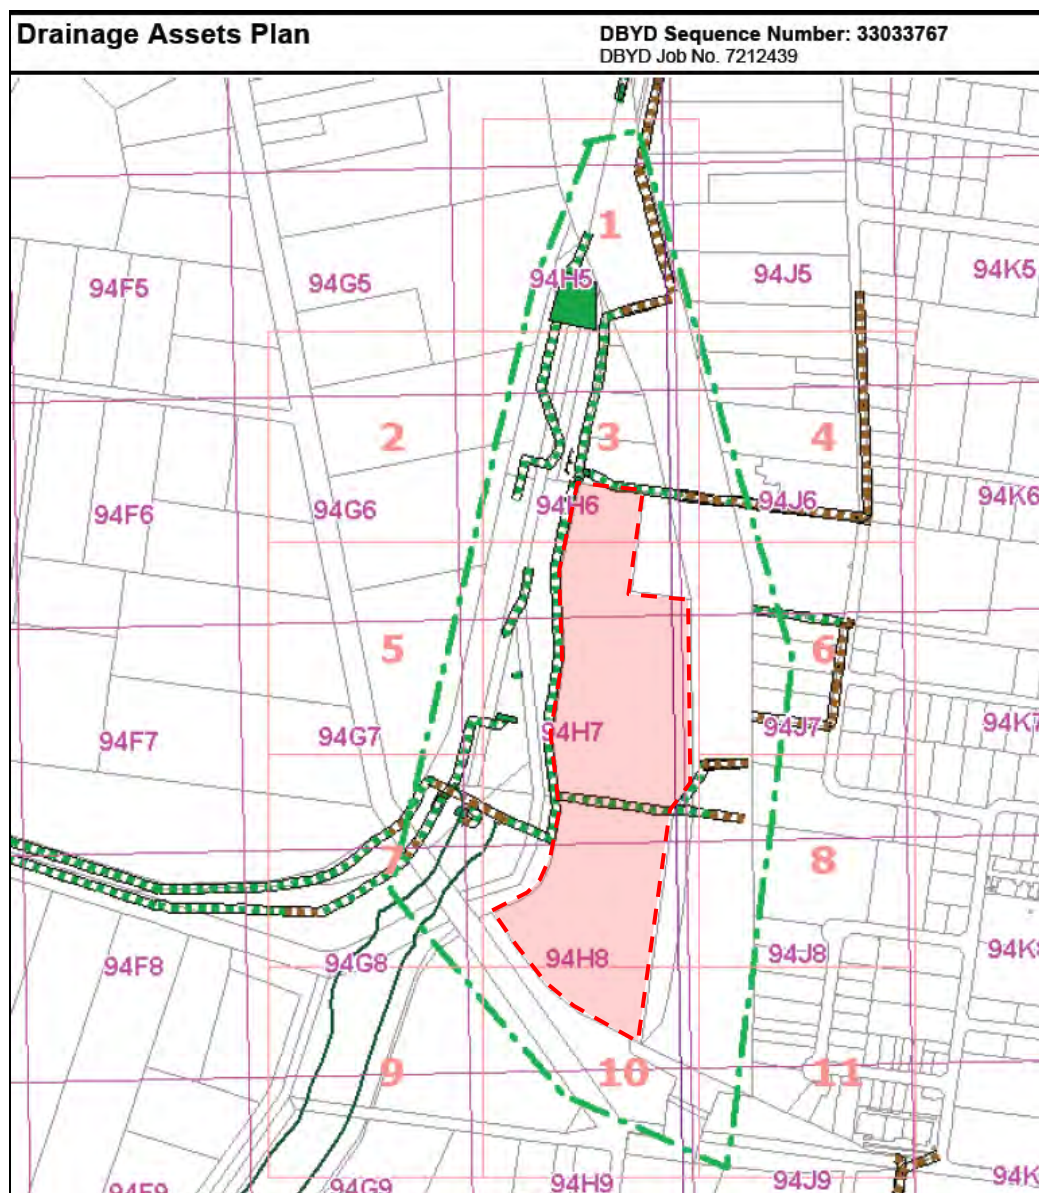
Melbourne Water Drainage Assets Plan, DBYD Info 13 March 2014
